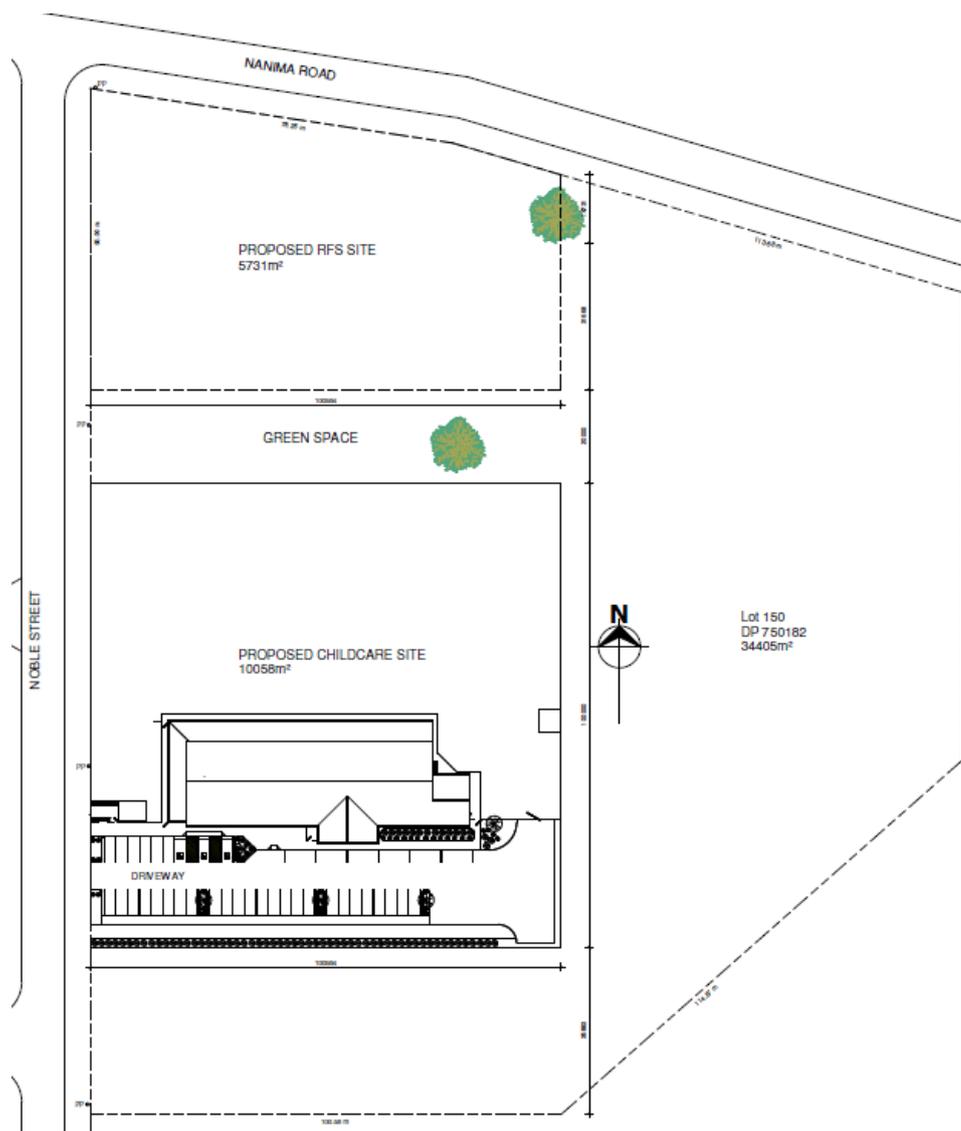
Proposed Location (Site) Plan (from submitted drawings by Highlands Design)
